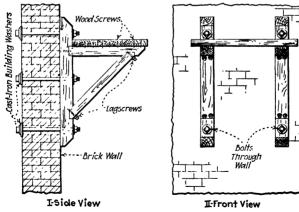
A simple bracket for supporting a motor on a brick (or other) wall.
